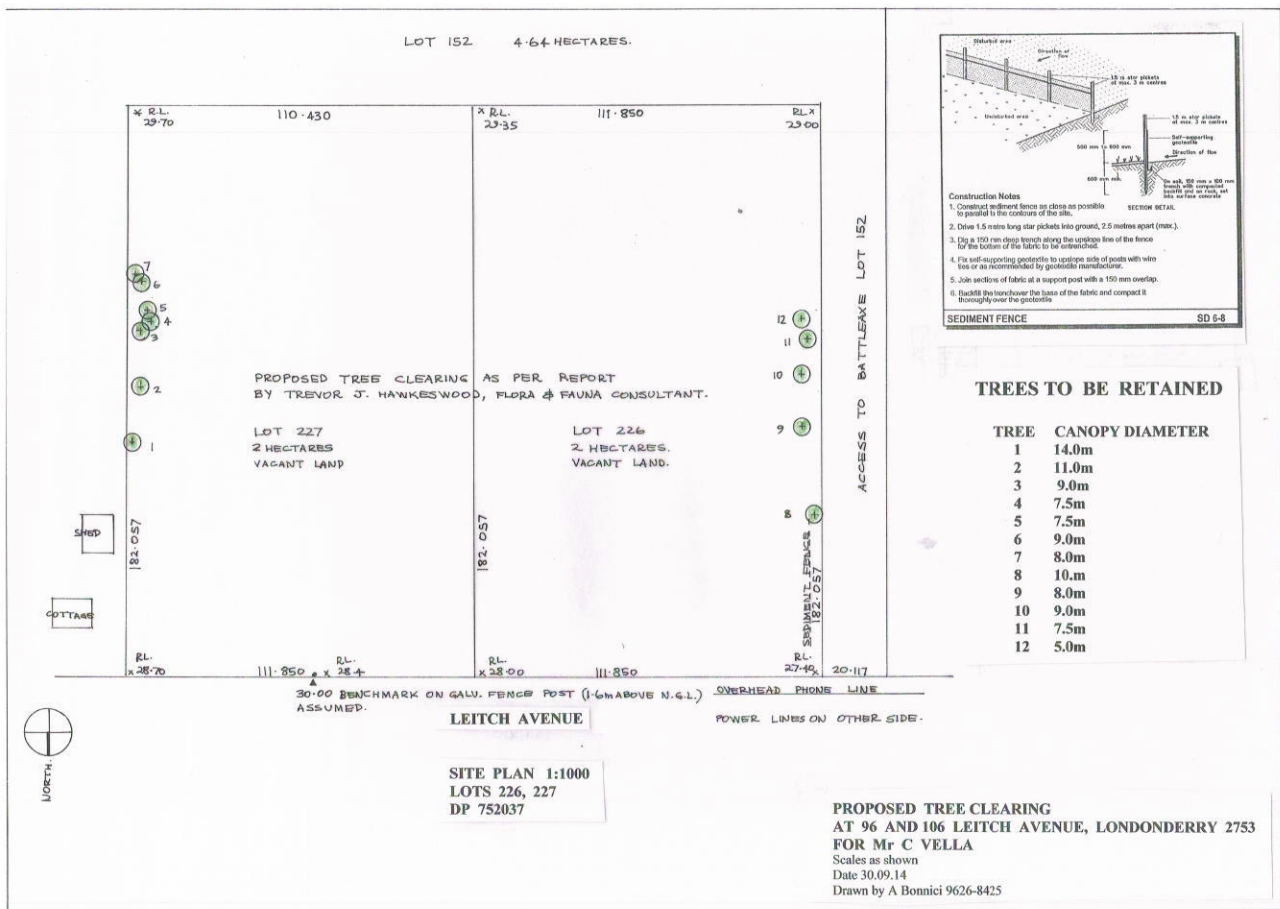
Plan of the subject property showing trees to be retained and details of sediment fences to be installed.
